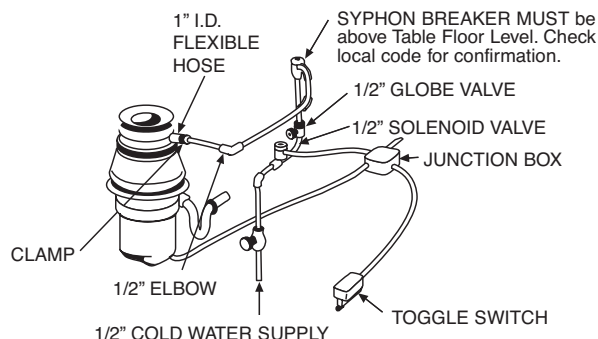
SWIRL SPRAY(S) ASSEMBLY
